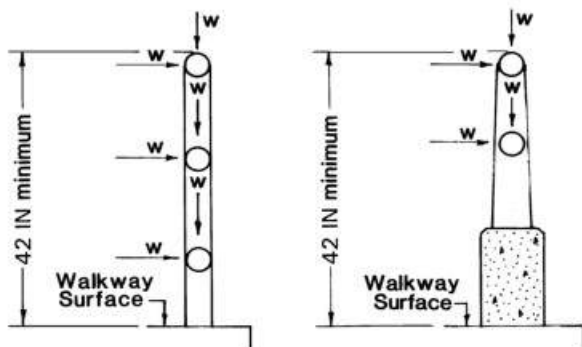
Pedestrian Railing Loads—To be used on the outer edge of a sidewalk when highway traffic is separated from pedestrian traffic by a traffic railing. Railing shape illustrative only.
